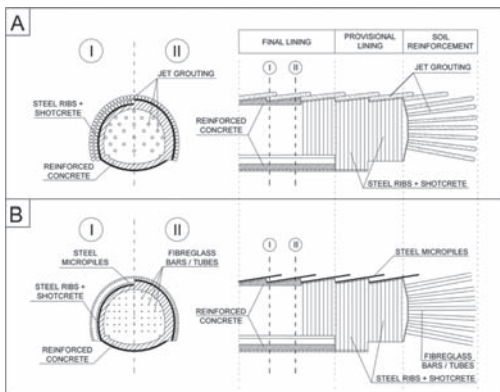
Schematic drawings of the canopy technique: A—reinforcement by jet grouting columns, B—reinforcement by steel micropiles and fibreglass bars or tubes.
